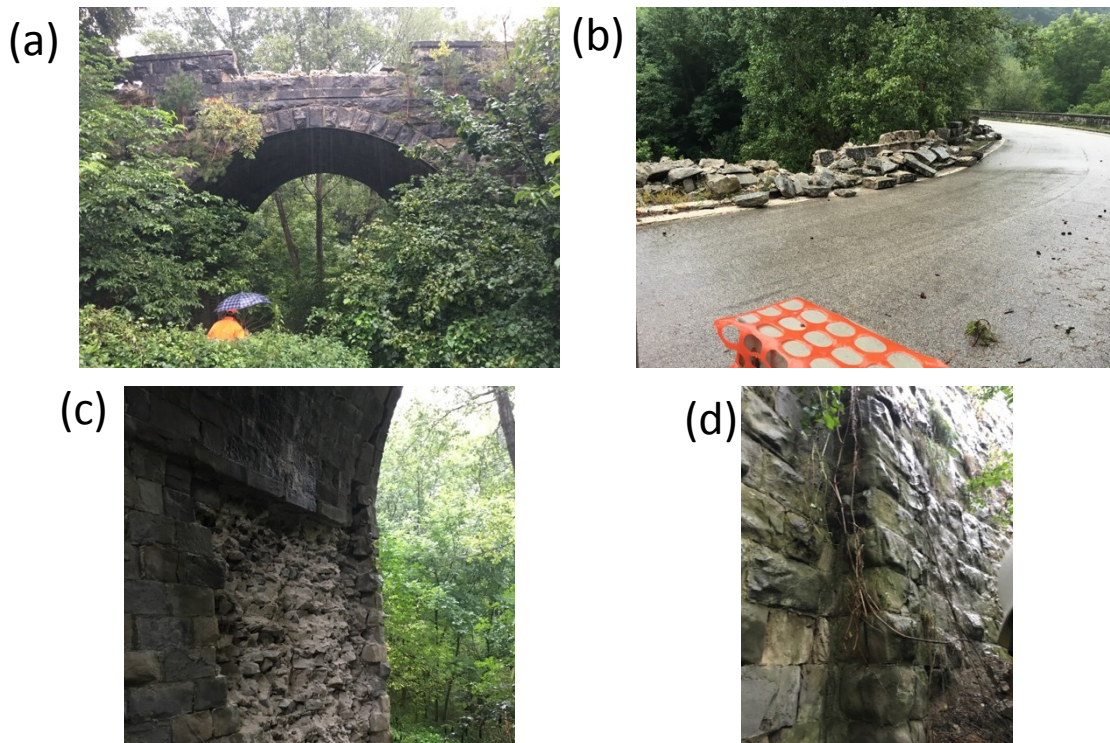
Central arch of the three arches masonry bridge along the Trisugo route (42.73538 deg, 13.253655 deg): partial collapse of the railing (a, b) spalling (c) and cracking (d) of some masonry elements.
